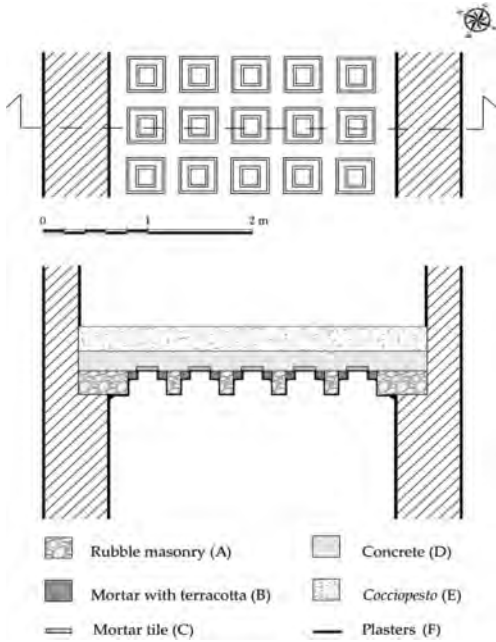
Map and section of the concrete floor in area N° 46 (Hélène Dessales).
